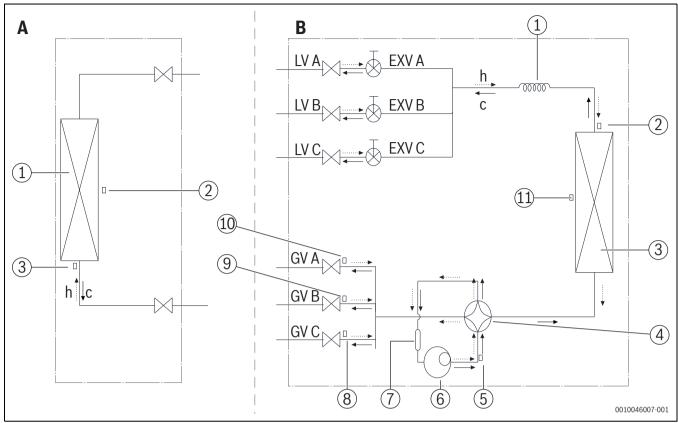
Refrigeration circuit drawing of inverter 1 drive 3 type
